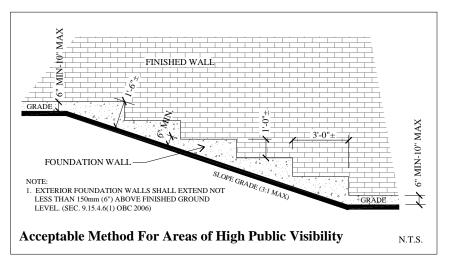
Stepped Foundation Wall Detail for Sloped Grade Conditions
